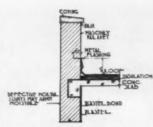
This drawing shows a durable method of roof flashing set in a masonry wall. Under some conditions the flashing can be improved by extending it all the way through the wall.
